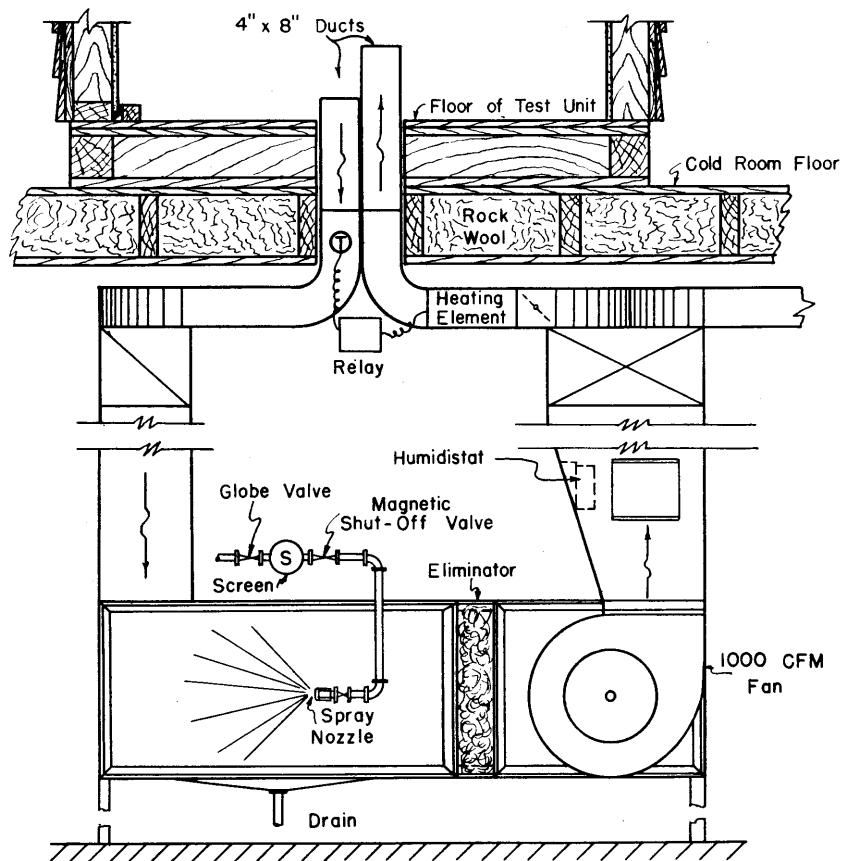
SECTIONAL VIEW OF AIR CONDITIONING UNIT WITH DISTRIBUTION DUCTS TO TEST HOUSES IN COLD ROOM
